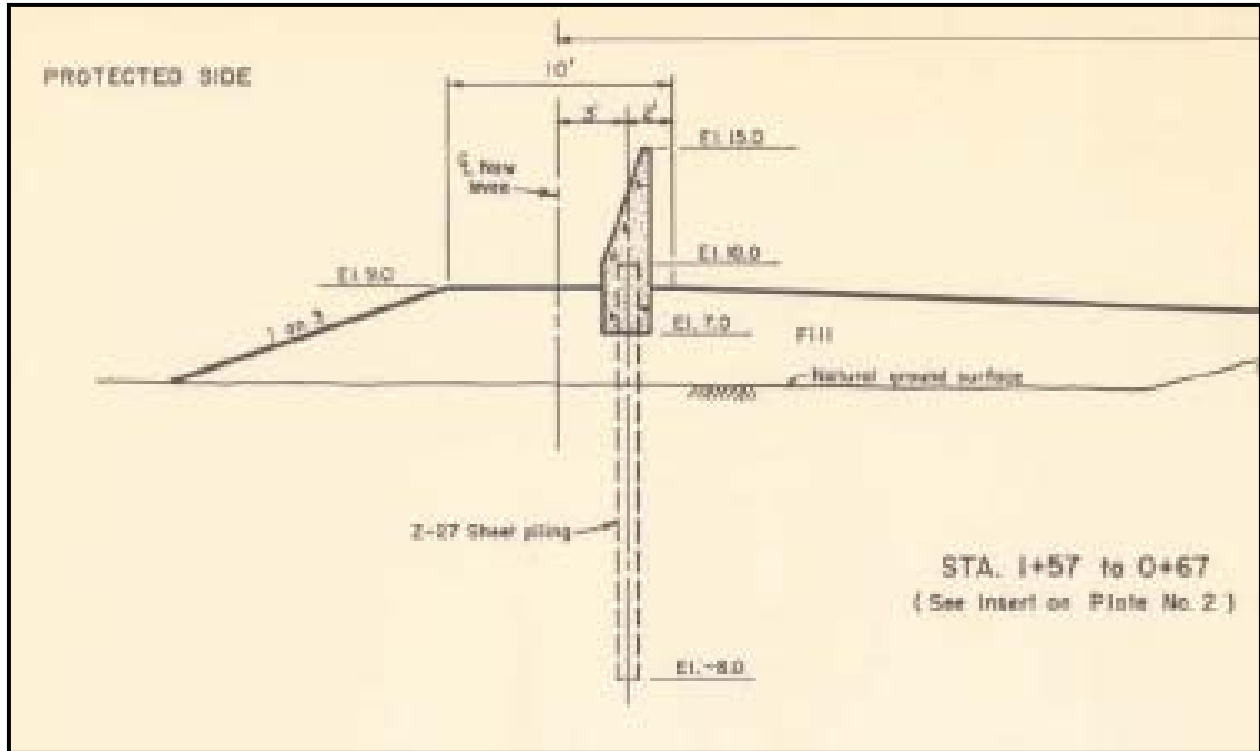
Pre-Katrina I-wall design section for Reach STB2 (depicts authorized elevations, not actual elevations)
